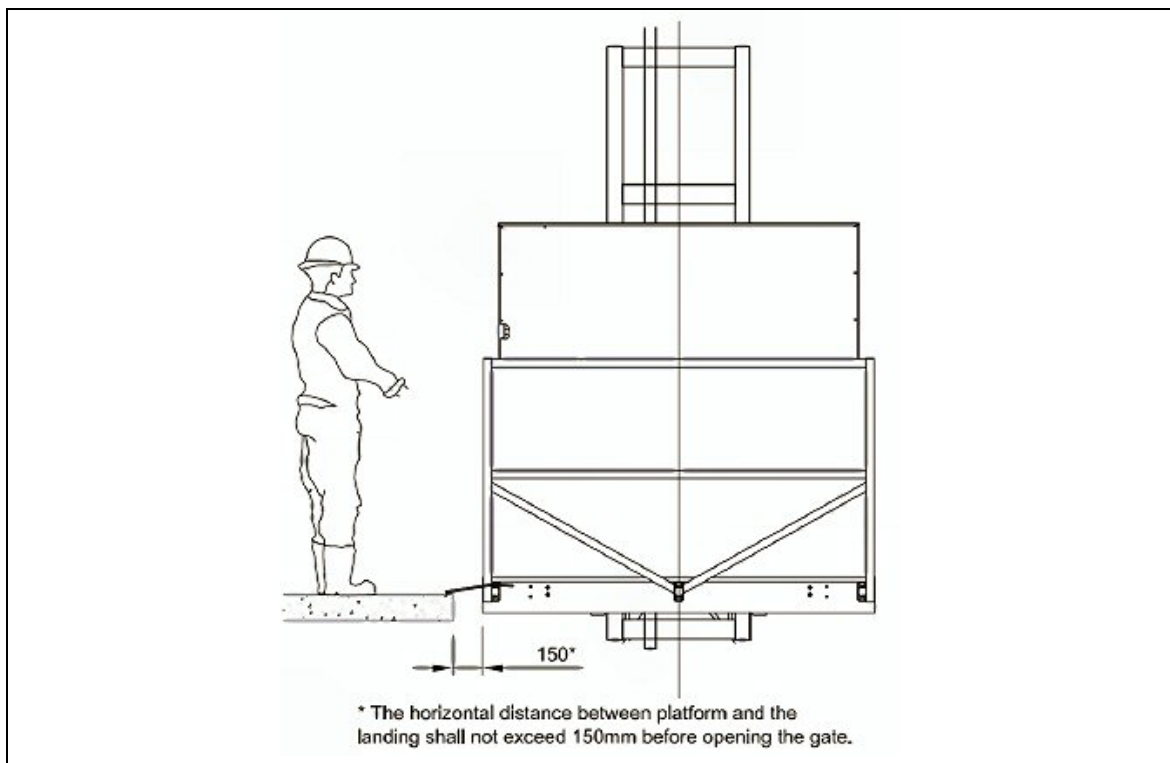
Typical Goods Hoist with Ramp at Open Gate
